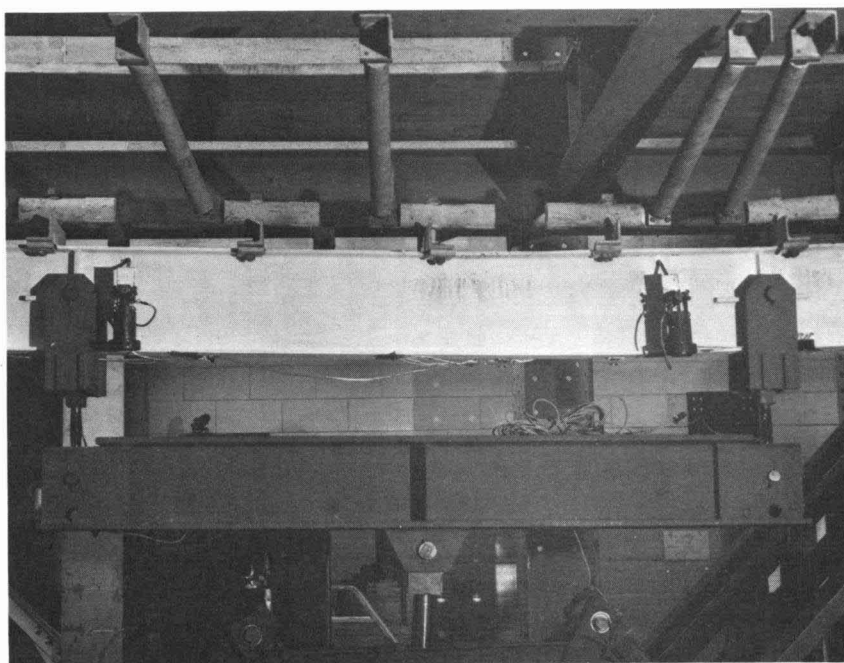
LATERAL BRACING SYSTEM FOR THE RESTRAINING BEAMS
